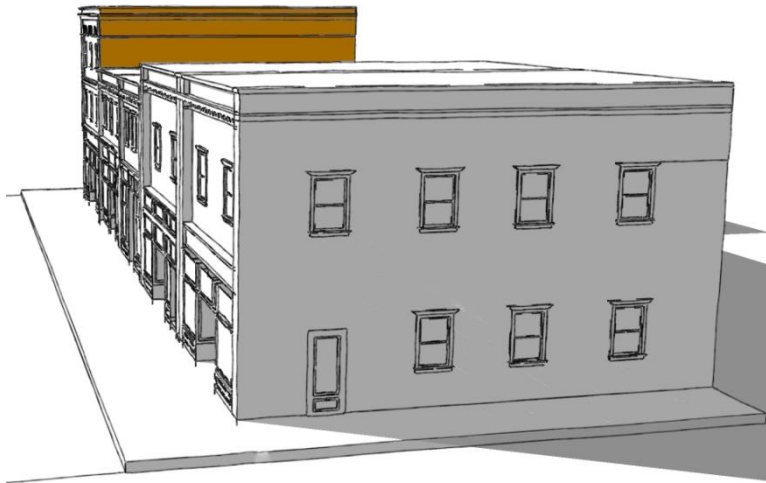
SECONDARY /CORNER SIDE FACADE
